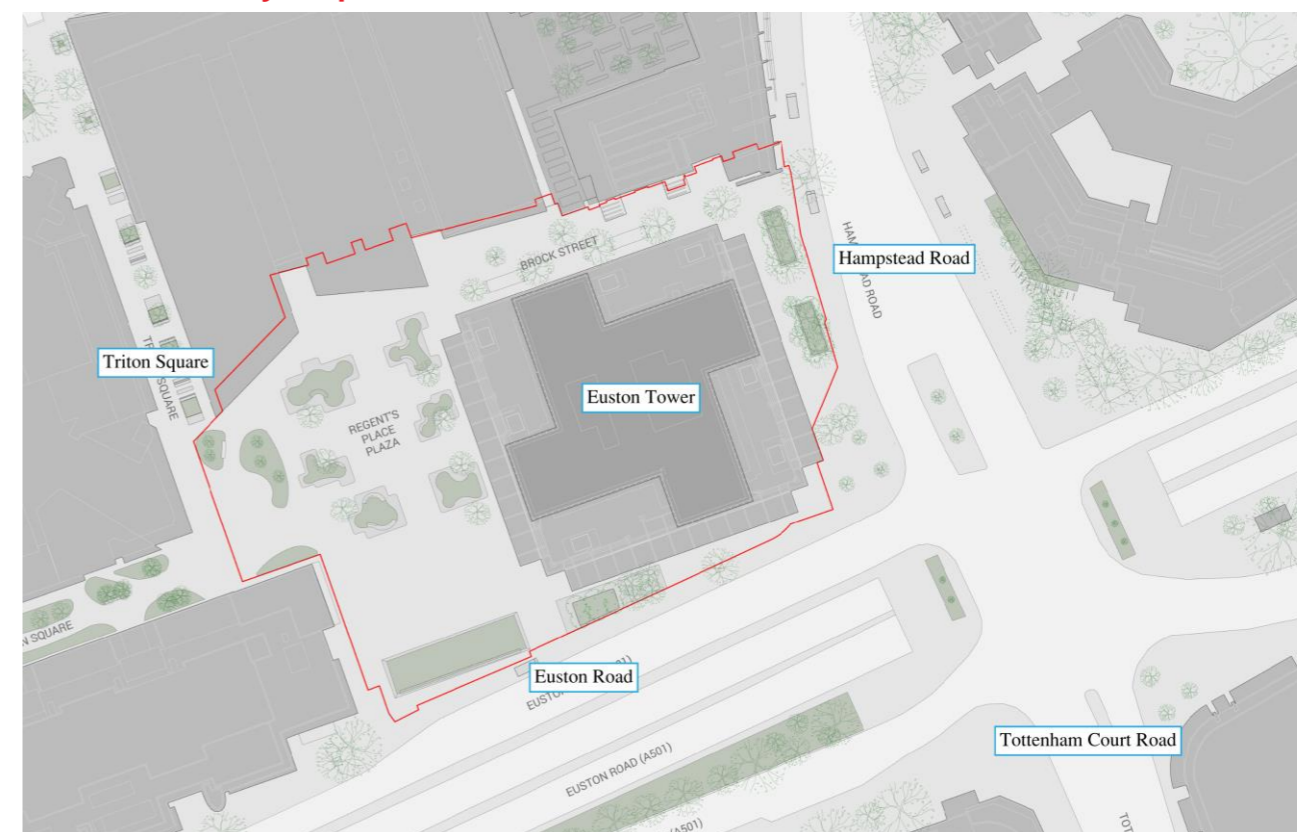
Euston Tower (in purple) within the context of the wider site surrounded by Euston Road (south), Hampstead Road (east), Brock Street (north) and Regent's Place (west)
